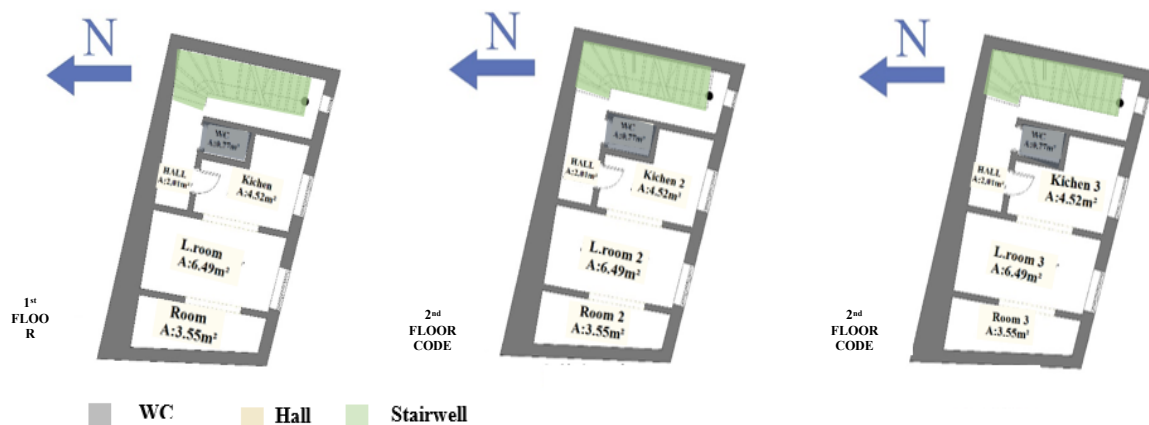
plan ground floor, 1st and 2nd floor code 278.
